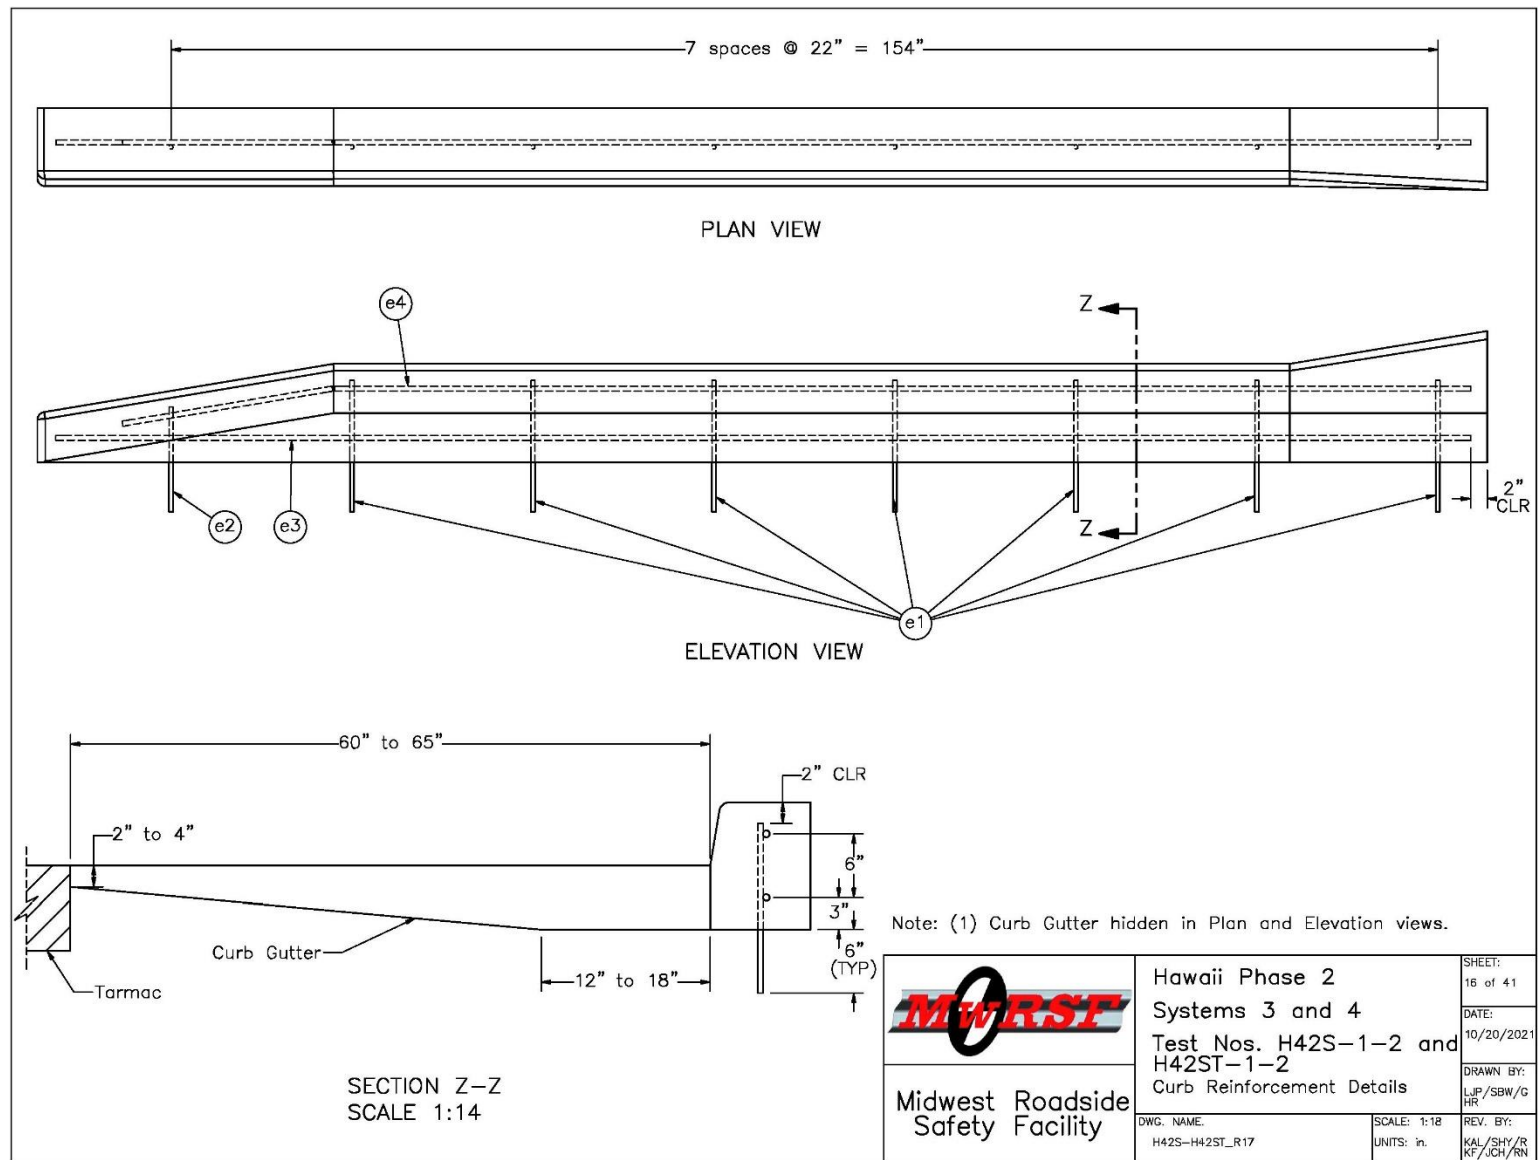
Curb Reinforcement Details, Test Nos. H42S-1 and H42S-2
